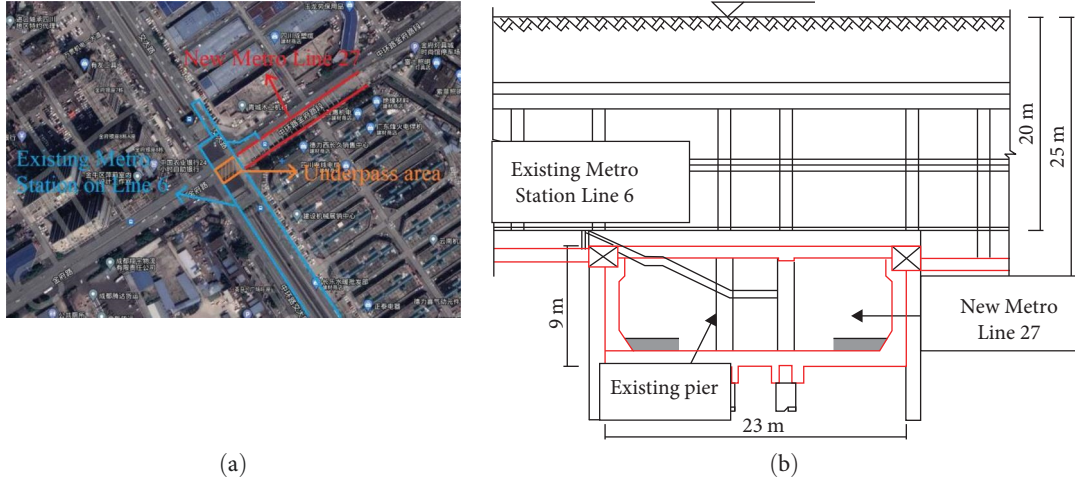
Overhead view and longitudinal section plan; (a) plan view (b) profile digram.
